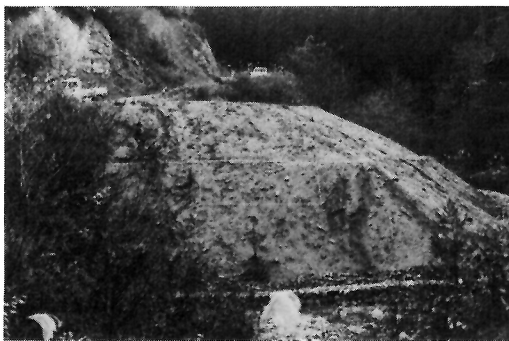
Experimental plot No.10 on banking slope of forest road construction in 1983 (Dec. 5, 1984)
